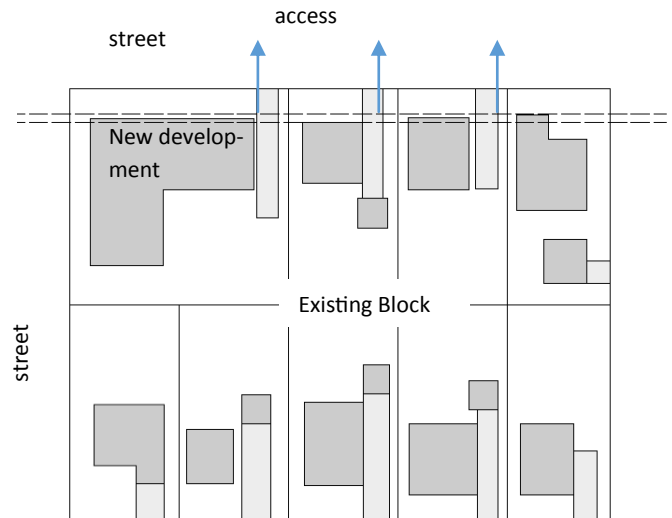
Maintain the typical pattern of access along the block and building on corner sites should front both streets..
